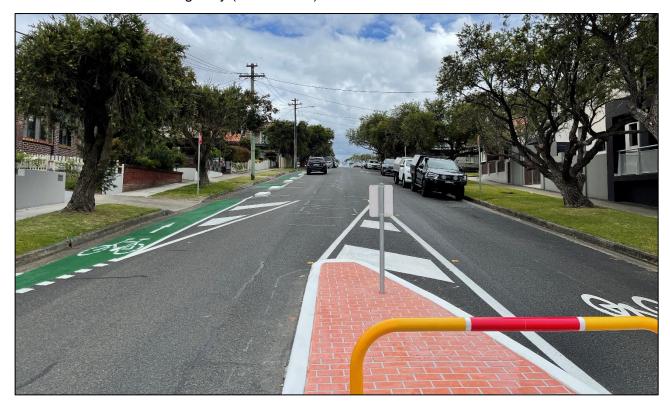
HEATH STREET (NORTH FACING) FROM THE INTERSECTION OF HENLEY
